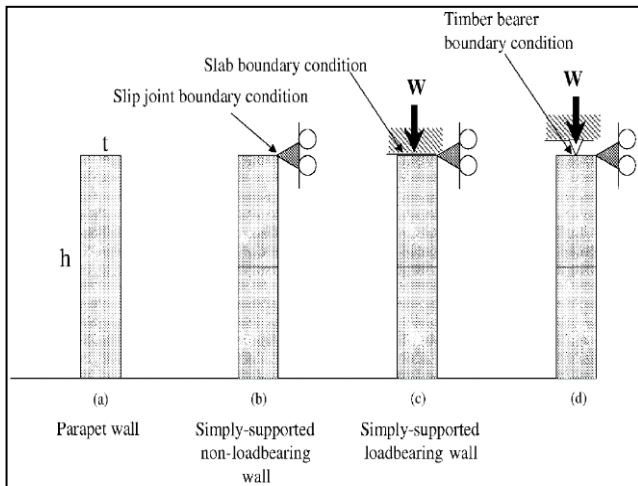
Unreinforced masonry wall support configurations (Doherty et al., 2002)
